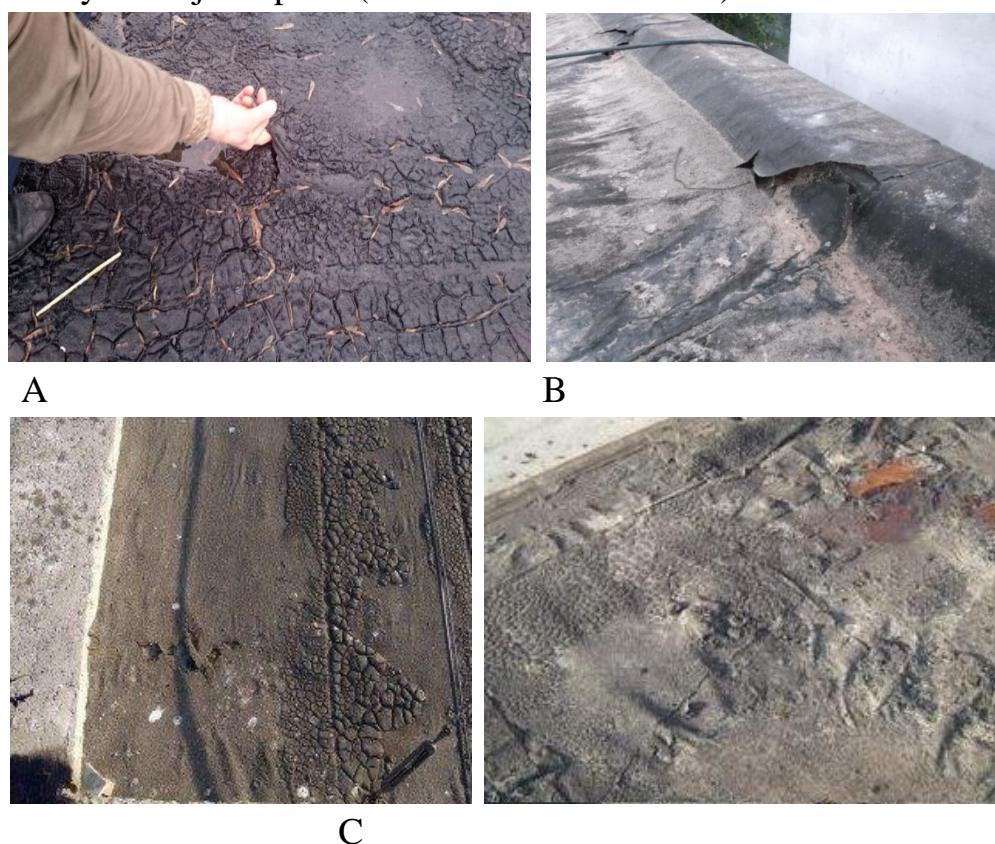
Flat roof: A- destruction of roofing material due to longitudinal-loyalty ultraviolet radiation; B-detachment of roofing material from the base; C -blasting of the roofing surface with deformation
